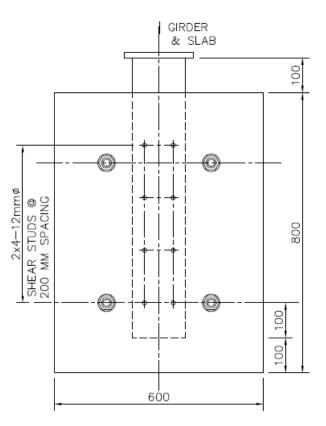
Elevation of specimens PO-1A and PO-1B showing arrangement of regularly spaced
